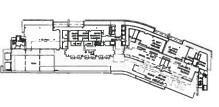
BUILDING PLAN - LEVEL 14 ONE BEVERLY HILLS
